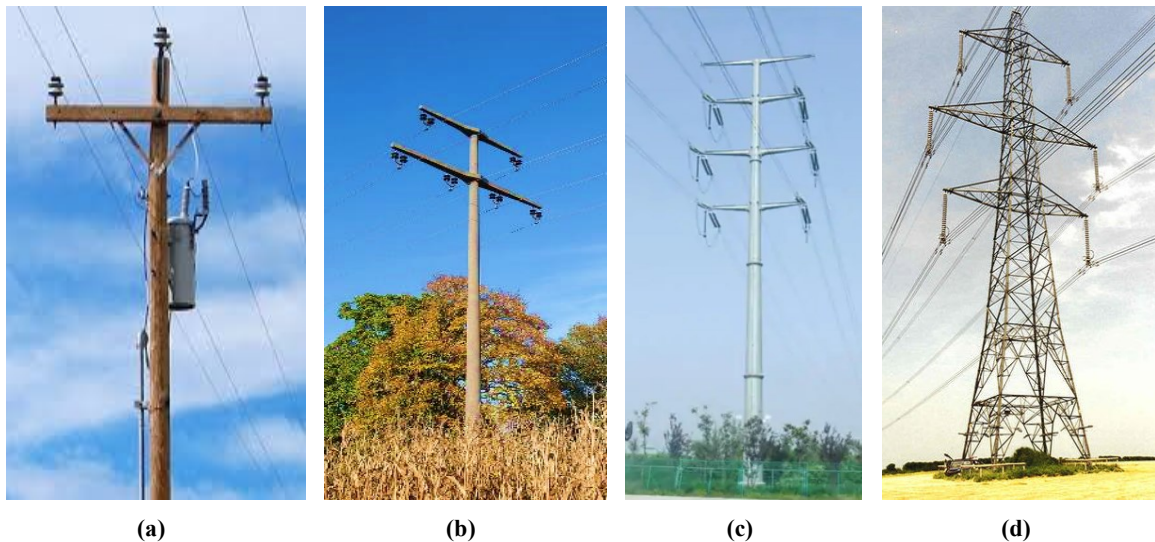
Typical structure for a (a) wooden pylon, (b) concrete pylon, (c) tubular steel pylon and (d) lattice tower
